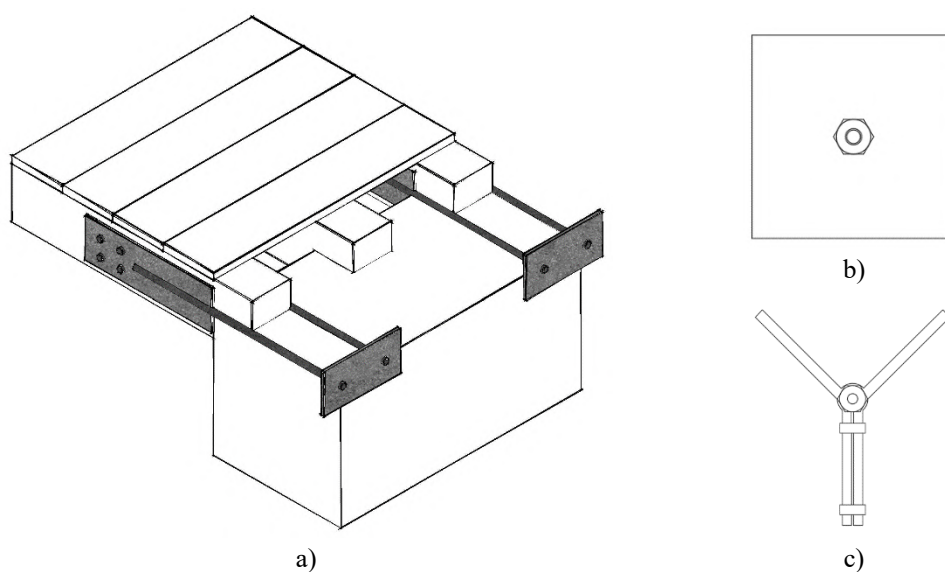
Example of connection floor-to-wall (a) and of external anchors (b, c)
